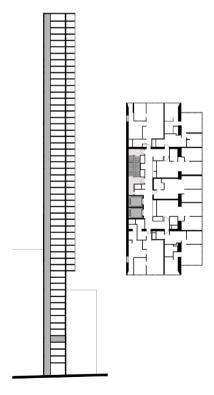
Collins House: plan and section (developed by authors based on [50])
